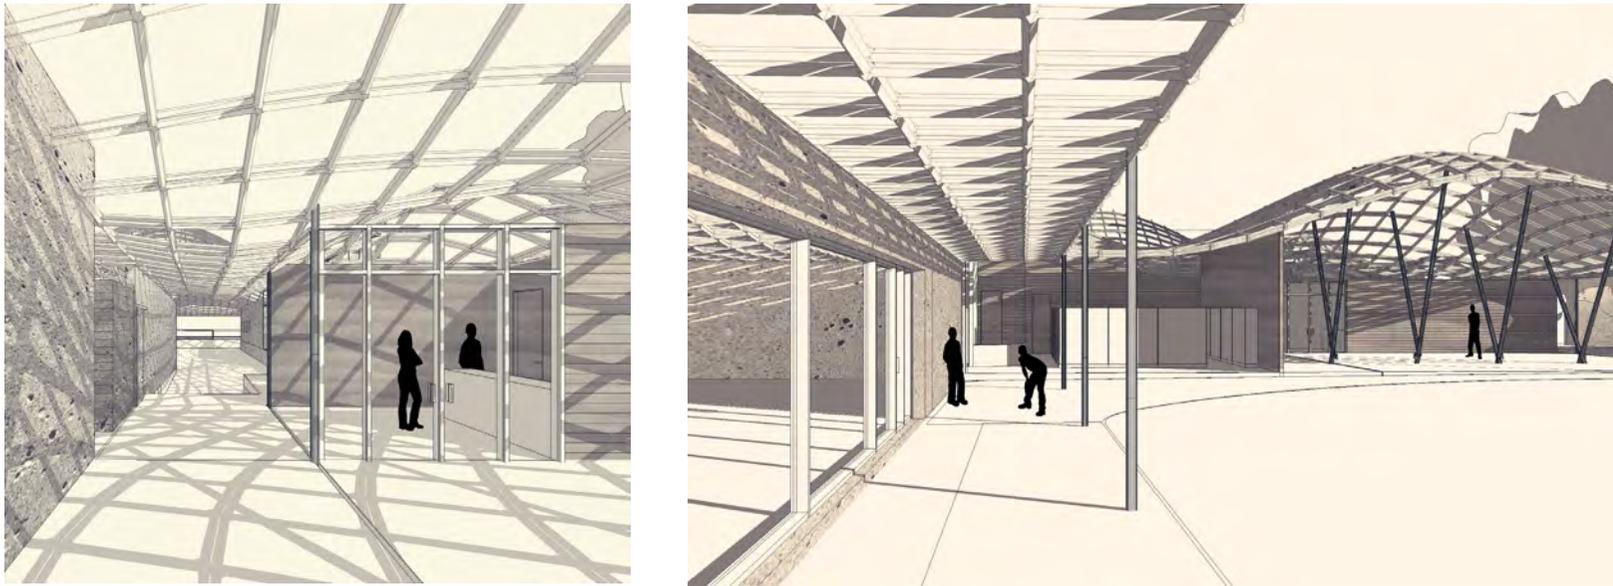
(Left) The public accessway, with view directly to the water. The roof pinches down at this point to define a transition, better seen in section.
